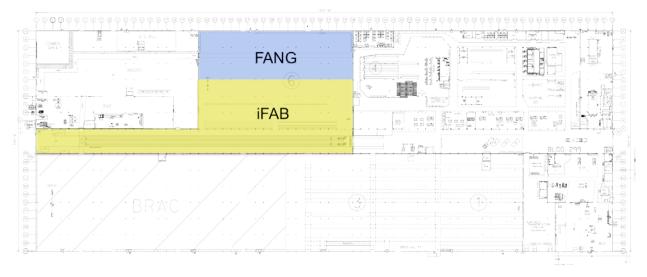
Building 299 layout with iFAB Foundry area highlighted in yellow and FANG area in blue
